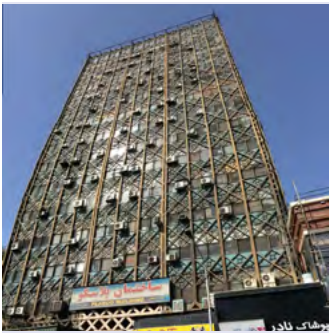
South face (street side) of the Plasco Building in Tehran, Iran.
